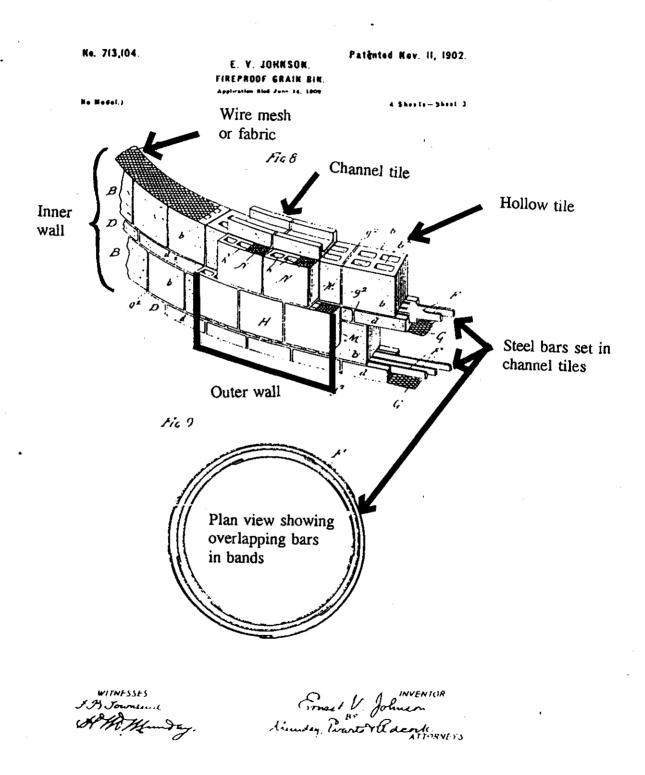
Plan view and cutaway view of patented tile wall construction for the grain bins of St. Anthony Elevator No. 3. (Source: Patent No. 713,104, Fireproof Grain-Bin, Ernest V. Johnson, Chicago, Ill., filed 14 June 1902, serial No. 111,599.)
